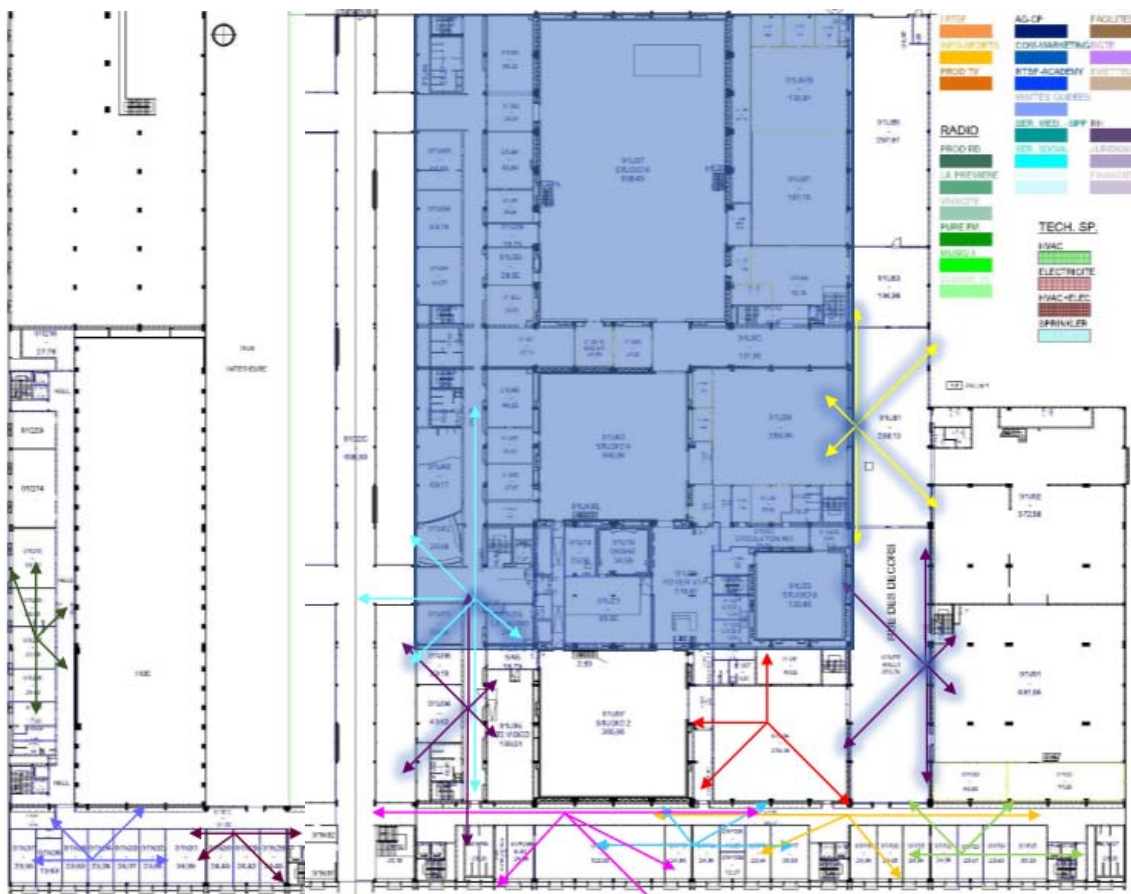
Design at 2.4 GHz for Floor 1 in Building CHJM
